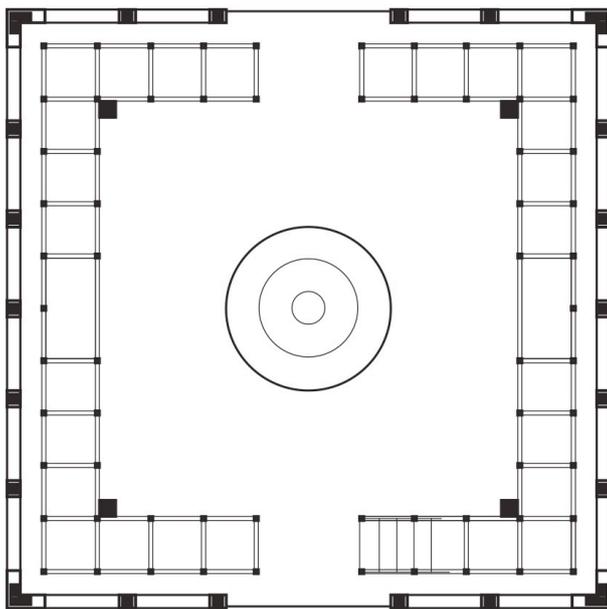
Tropical Space. 2017. Terra Cotta Studio Floor Plan.
